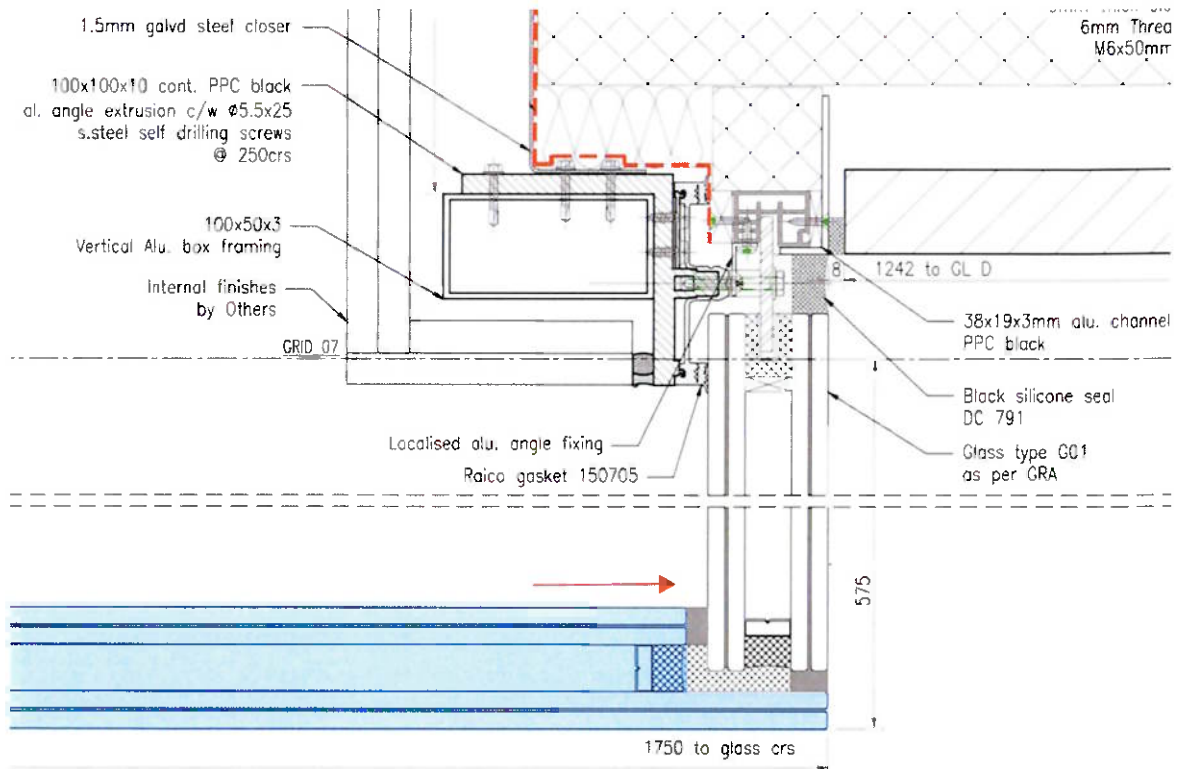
EWS-001 Plan view, glass-to-glass corner condition adjacent to Gridline D, South elevation.
